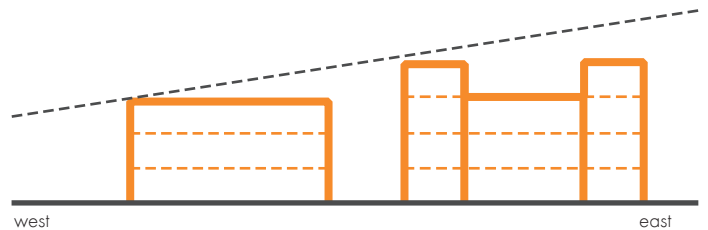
Illustrative section showing layering of building heights at York Yard Gateway
